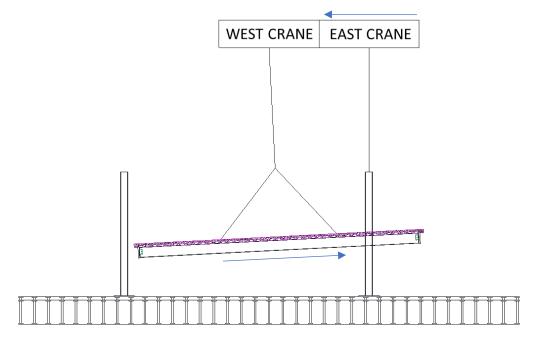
Elevation View of Crane Impact and LWACB Sway
